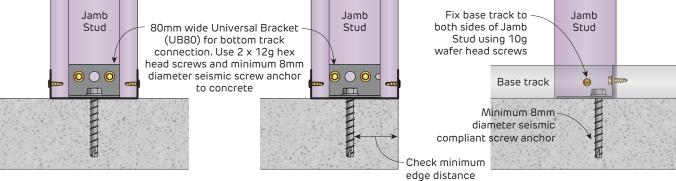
Base Connection BC6 for Prefabricated Door Frames Section
